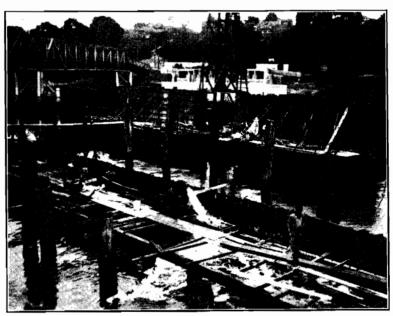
Hoddle Bridge-General Arrangement of Construction Details.
